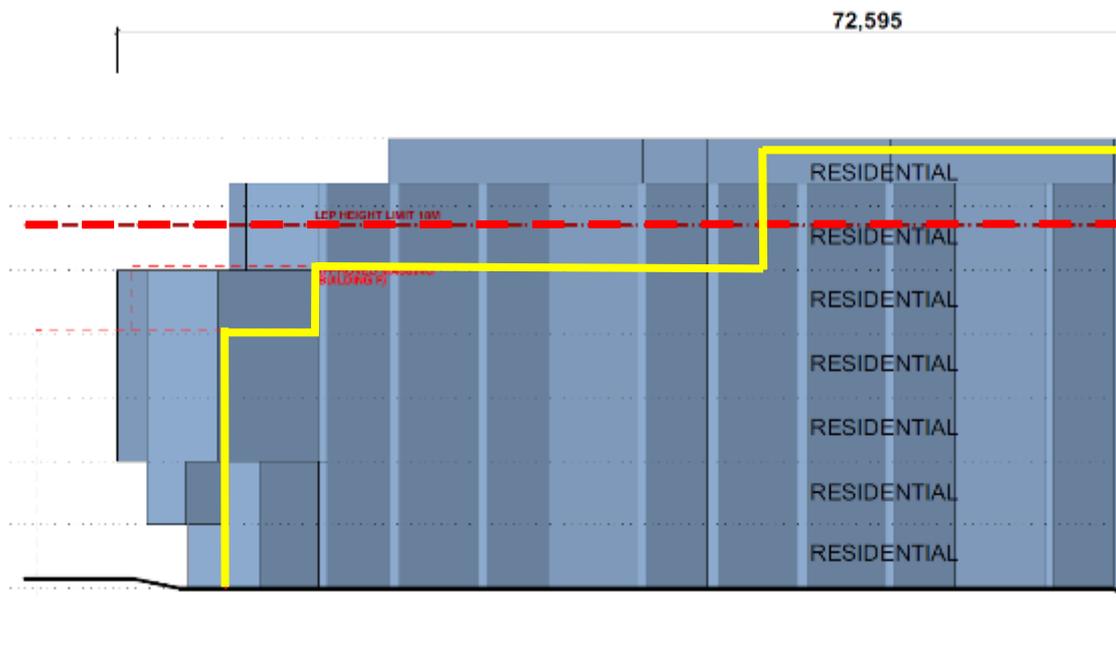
South elevation of building F (Parkside building). The yellow line shows the approved concept envelope and the red dashed line shows the 18 metre height limit.
